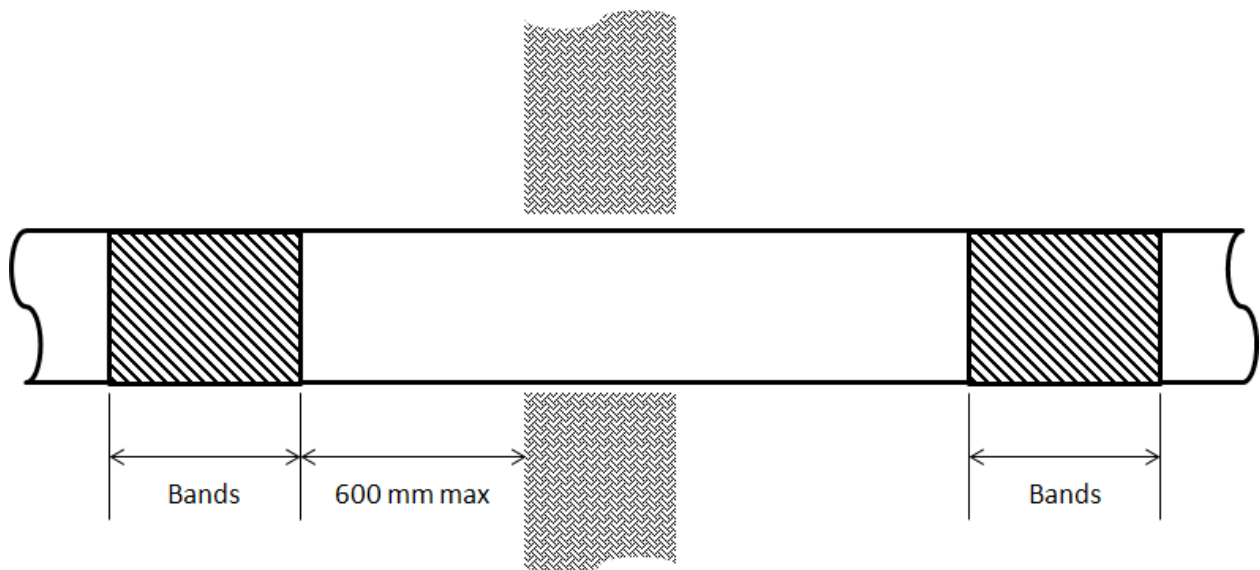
Colour Identification at Bulkheads, Wall Penetrations and Floors
